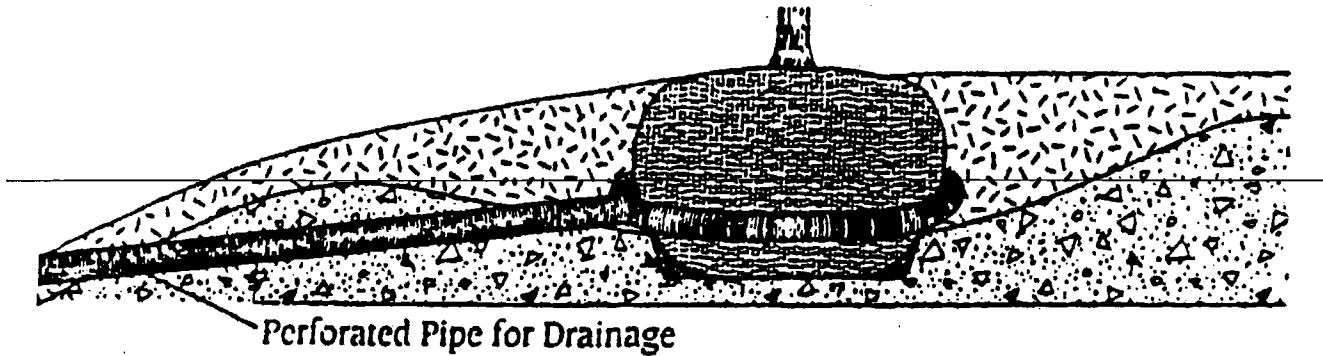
Acceptable Alternative Tree Planting Detail for Poorly Drained or Compacted Soils
